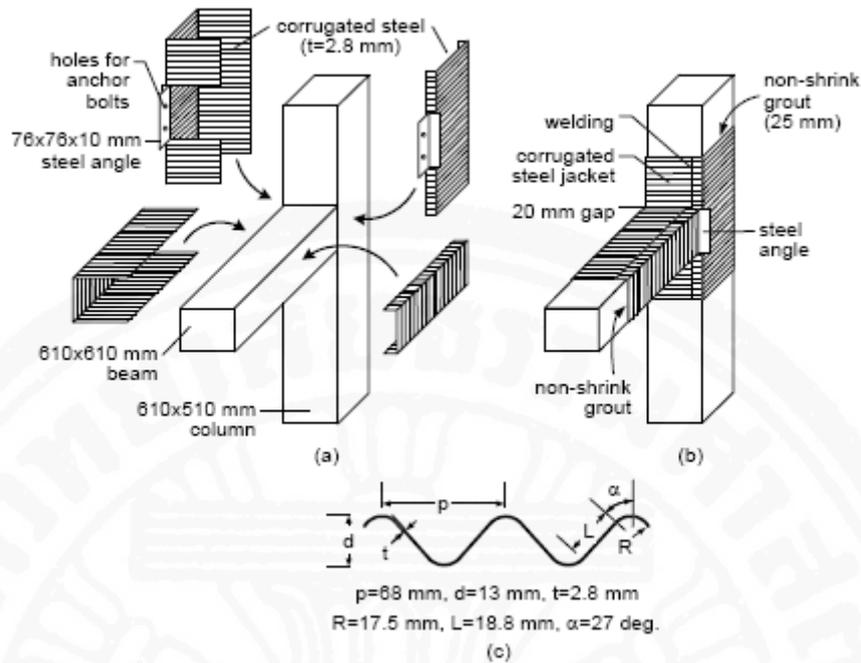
Corrugated steel jacketing technique proposed by Ghojarah et al. (1997) and Biddah et al. (1997): (a) before installation, (b) after installation, (c) cross-section of the corrugated steel plates.
